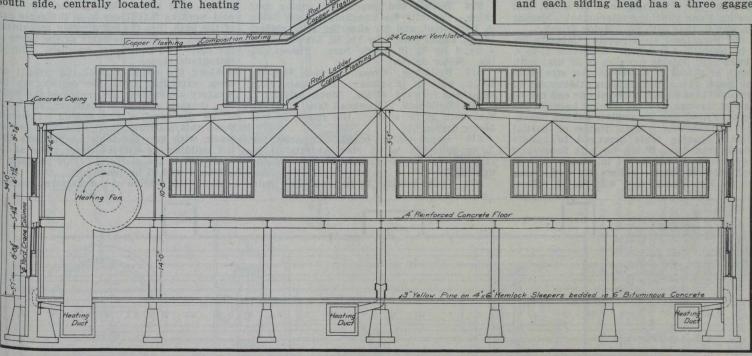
Cross Section of One of the Passenger Car Buildings, looking towards High End.
